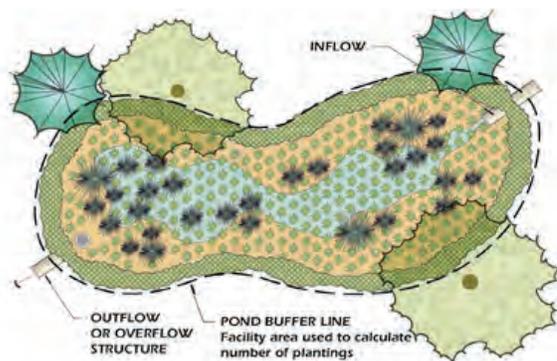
TYPICAL PLAN LAYOUT FOR A RECHARGE BASIN
